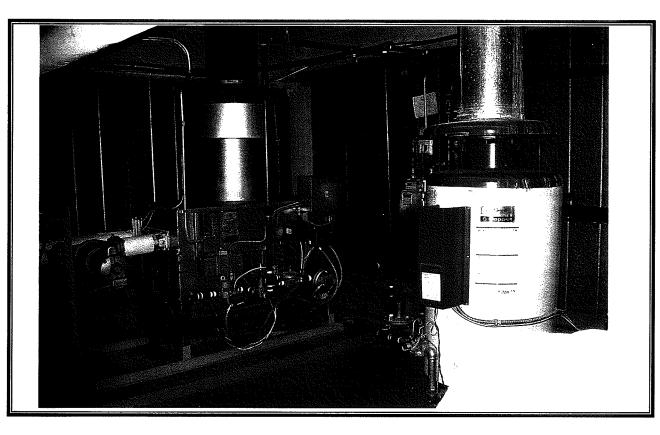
Photo Date 12/05/06 Midtown Tower - 18 th Floor Mechanical Room Lochinvar heating hot water boiler installed in 1978 and domestic hot water heater.
